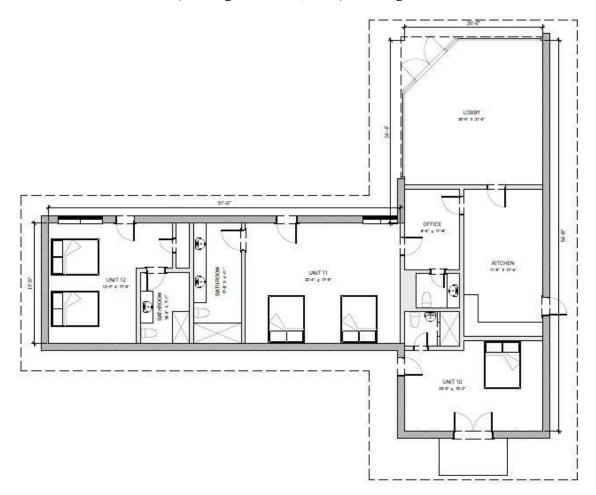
Grandview Courts-Siesta Motel As-Built Plans (Baldridge Architects, 2023): Building D.
